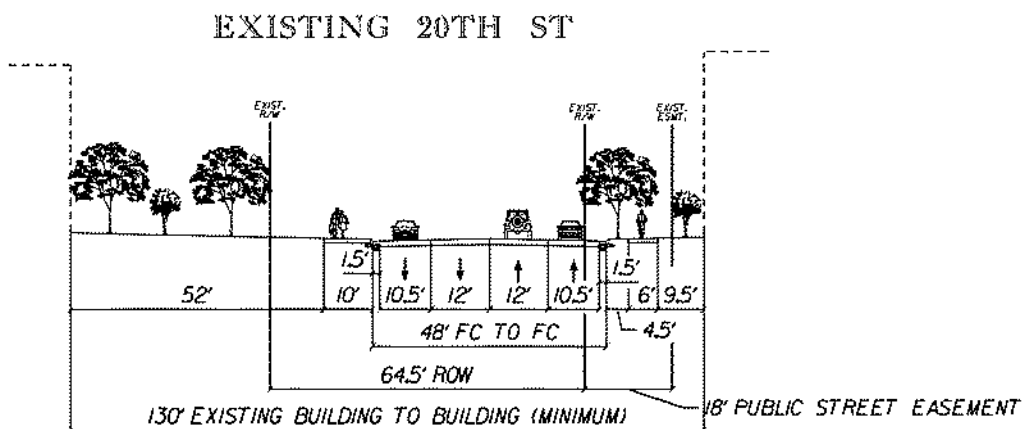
Existing 20th Street S Cross Section (looking east toward Route 1)
